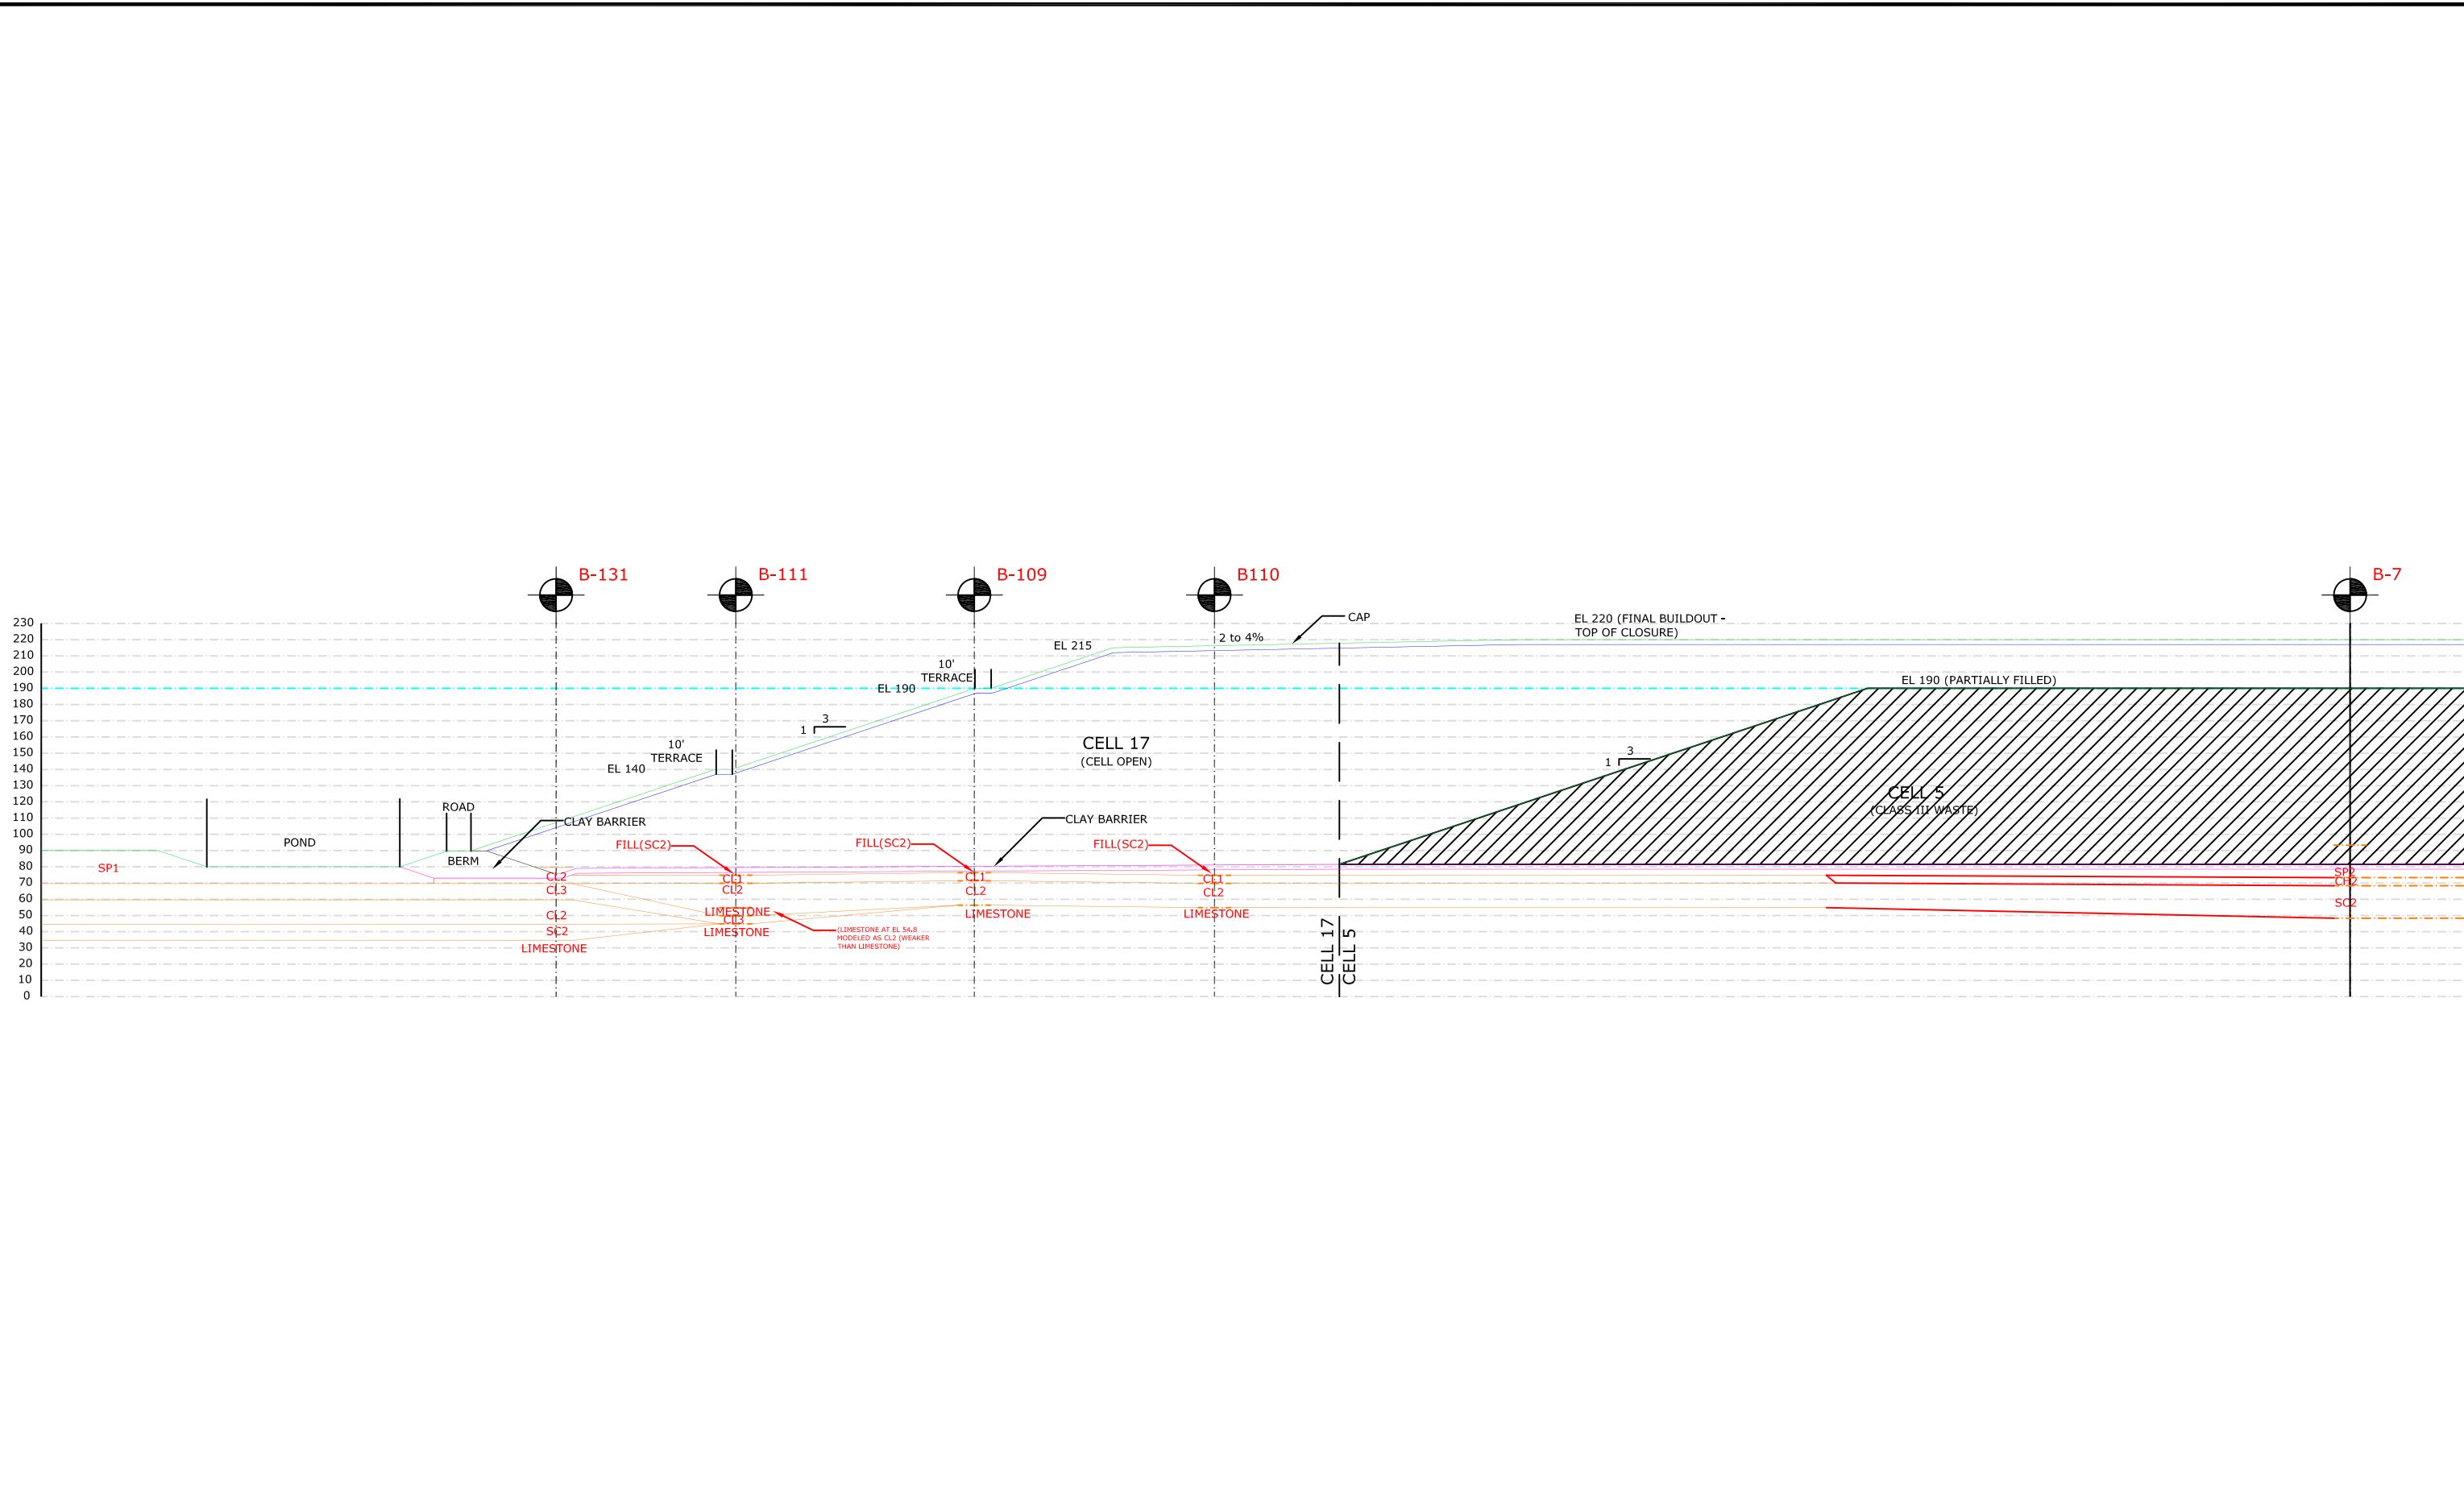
(REVISED FEB 2020). CELL 17 OPEN, NORTH/SOUTH SLOPE STABILITY SECTION
